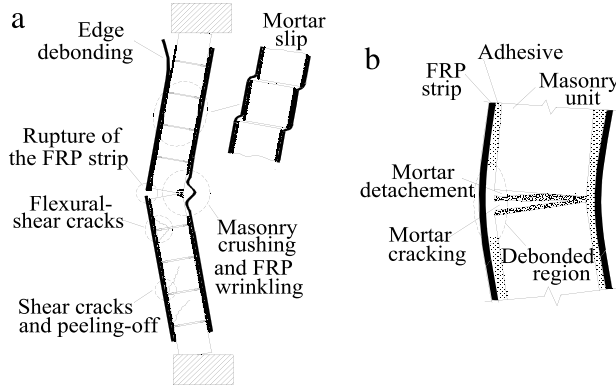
Structural behavior of the strengthened masonry wall under out-of-plane loading: (a) characteristic phenomena and (b) cracking/detachment in the mortar joint and development of debonded regions.
